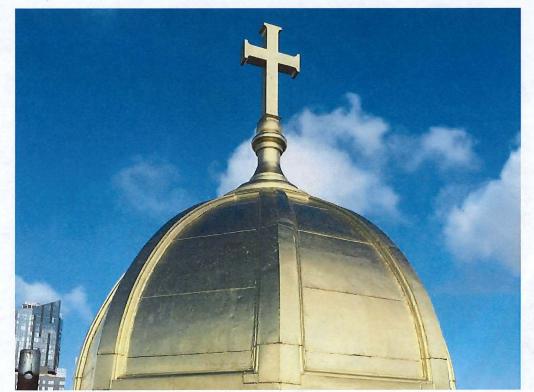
Detail, gilded sheet metal dome and cross. (Palisade Builders, 05/20/2018)
